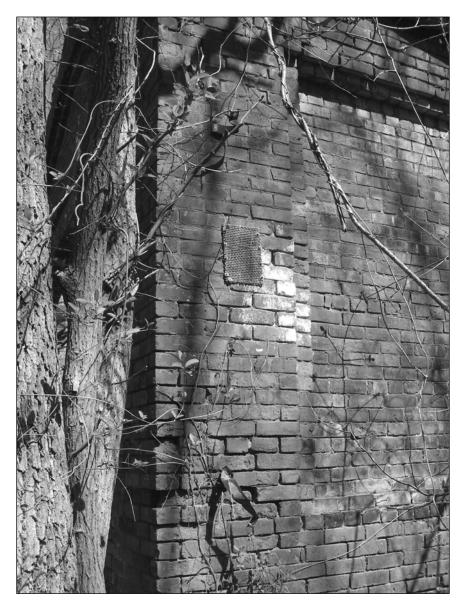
Exterior, northwestern corner, detail including coarse bronze screen covering opening in wall, facing east-southeast.
